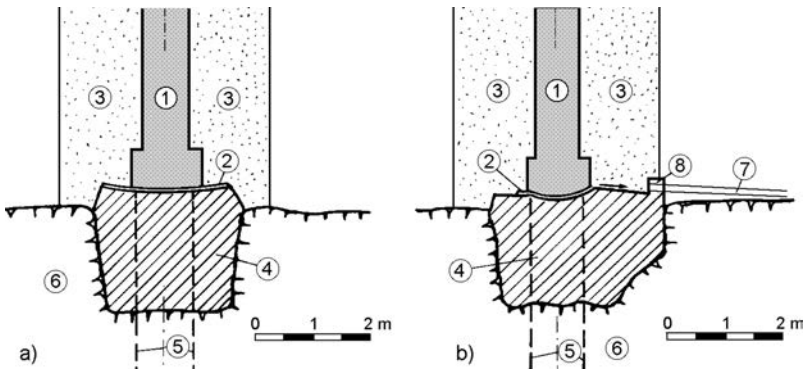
Joint of the asphaltic concrete core with concrete foundation (plinth) without a gallery. (a) Without control of seepage; (b) with control of seepage. (1) Asphaltic concrete core; (2) asphalt mastic; (3) transition zone; (4) concrete foundation; (5) grout curtain; (6) bedrock; (7) drainage pipe; (8) concrete wall.
